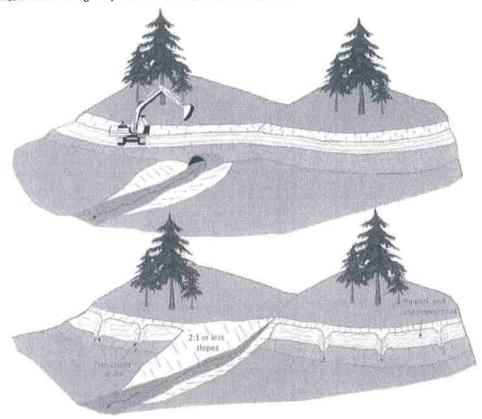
On roads that are to be closed (decommissioned), all stream crossing culverts and fills should be removed. Stream crossing excavations are best performed using an excavator. The original channel should be excuvated and exhumed down to the former streambed, with a channel width equal or greater than the natural channel above and below the crossing. Sideslopes should be laid back to a stable angle, typically a 2:1 (50%) gradient, or less. Spoil can be enchauled off-site or stored on the road bench adjacent the crossing, provided it is placed and stabilized where it will not etode or fall and enter the stream
